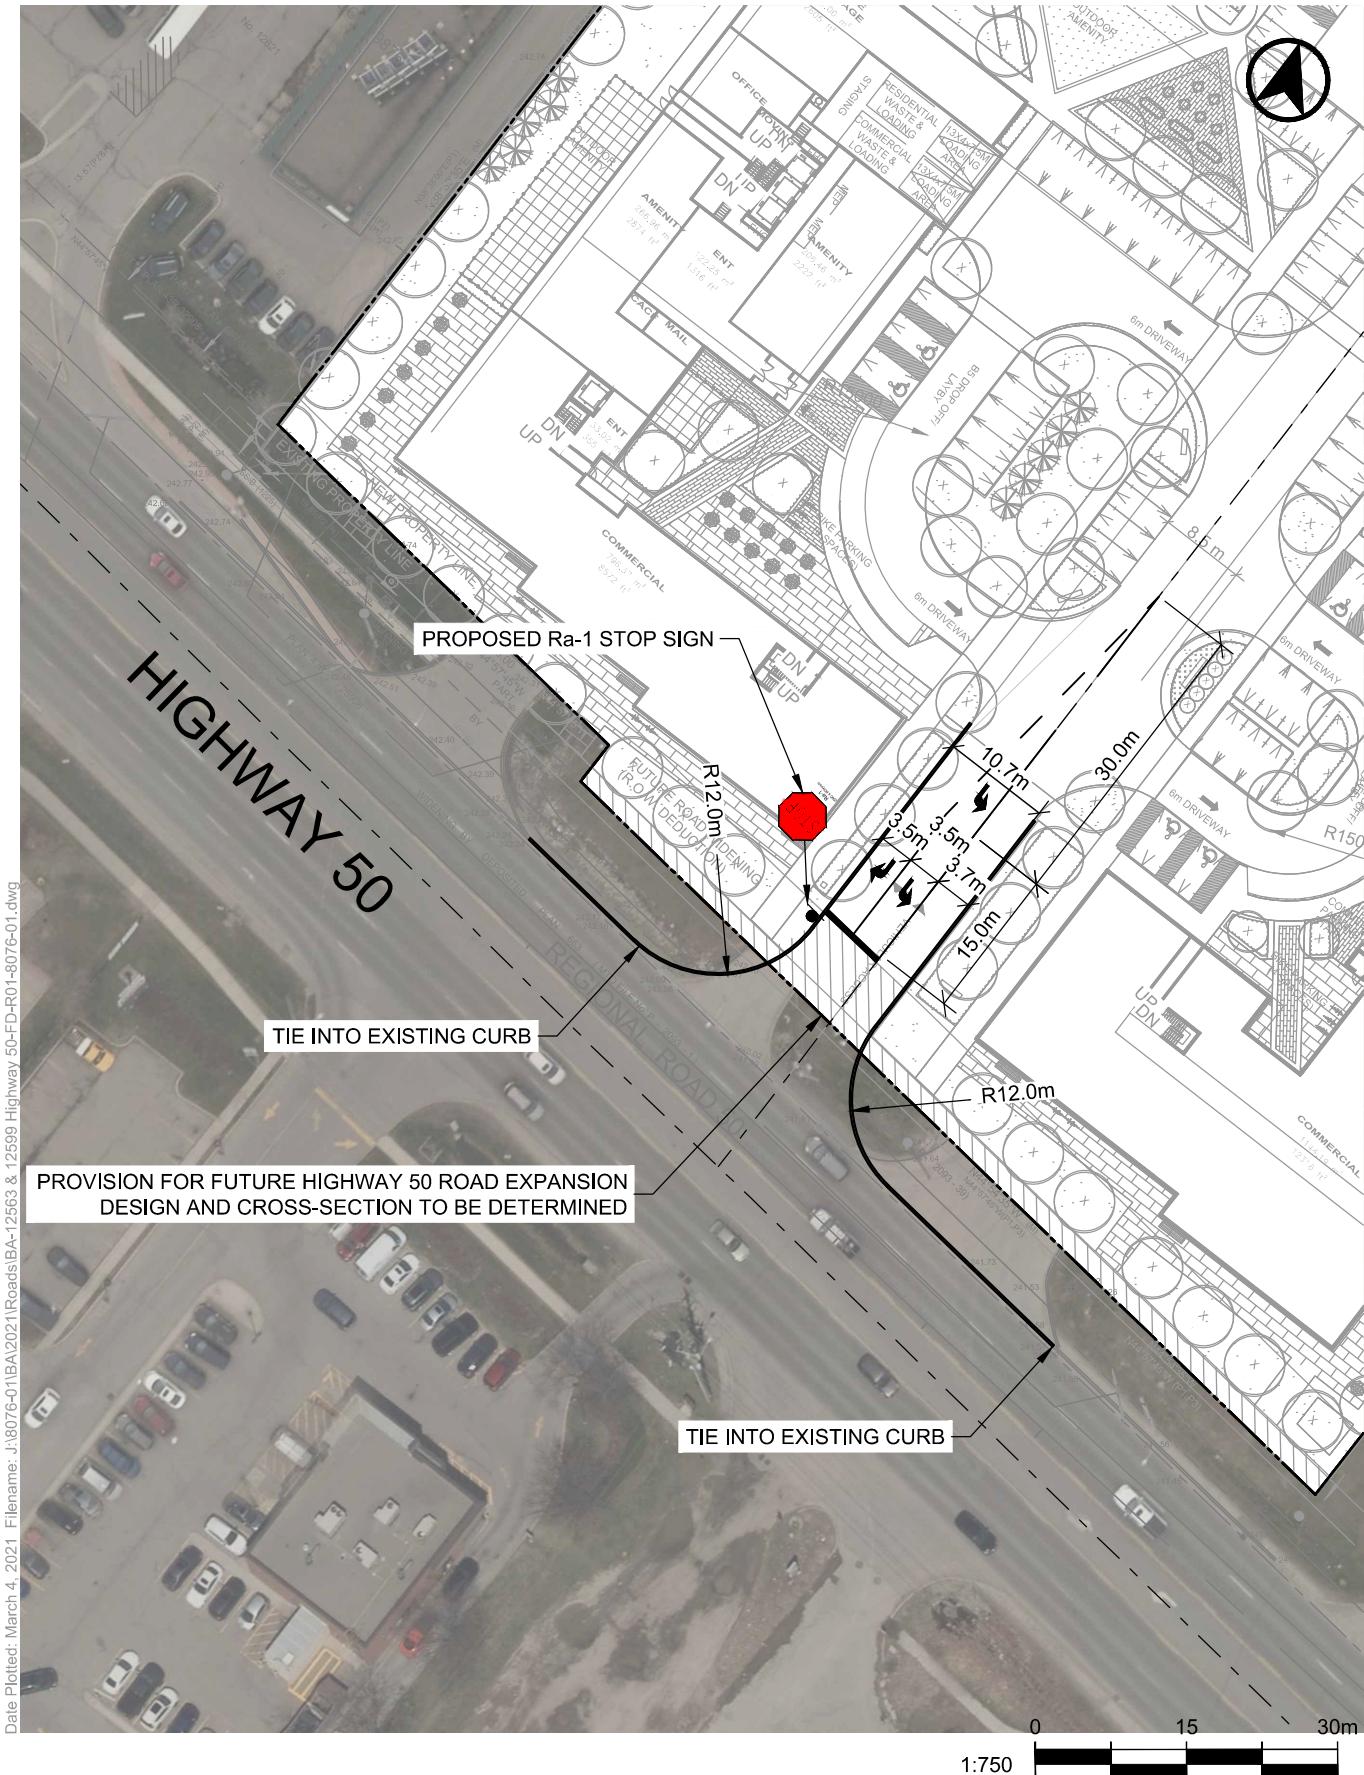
PROPOSED ACCESS CONFIGURATION AT HIGHWAY 50 & SITE DRIVEWAY
